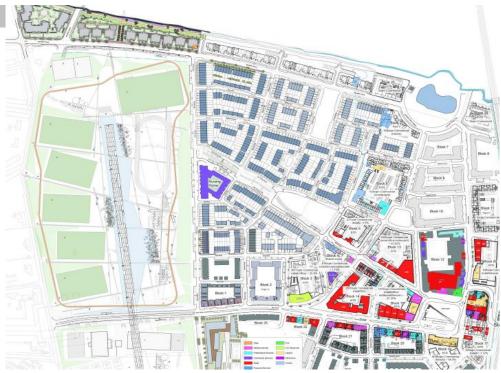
Proposed site layout with existing and proposed commercial areas.
